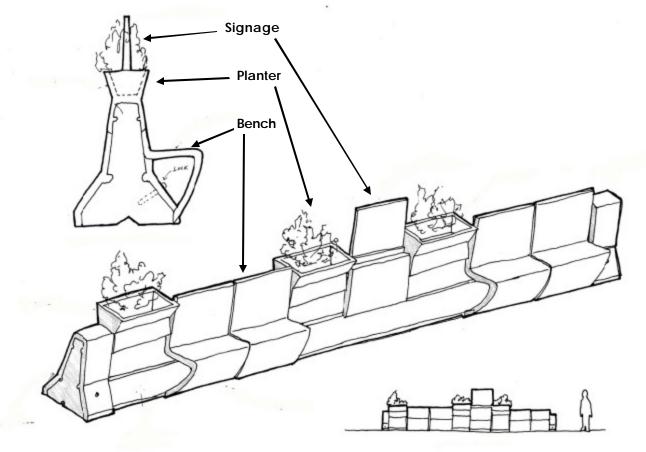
and 11 - Concrete Barriers with built-in benches and planters
